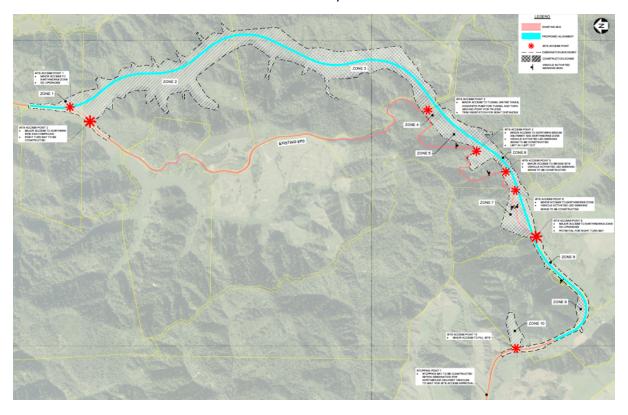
Location of Site Access Points along the route (refer to the Construction Traffic Management Plan in Appendix G for full size drawing)
